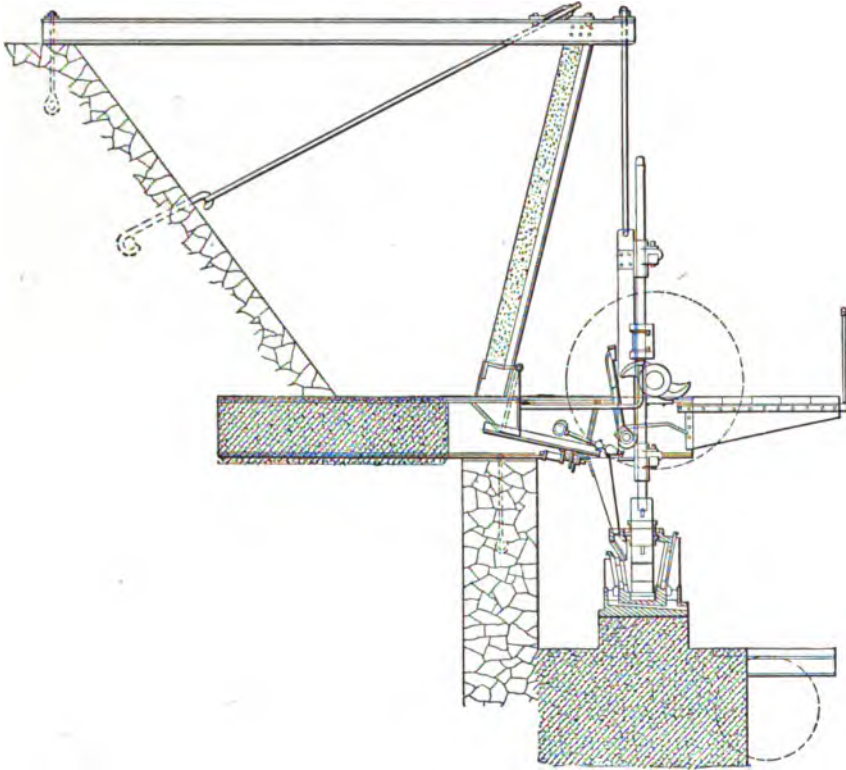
STAMP BATTERY WITH CANTILEVER FRAME.
